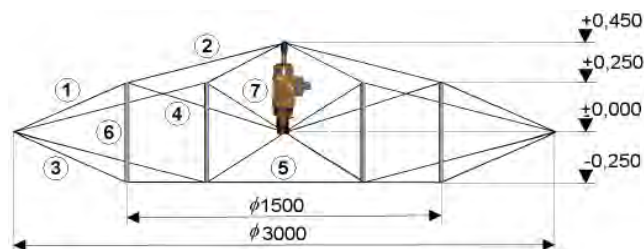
Section view of cable dome in Levy form with geometry and described basic structural members: (1) and (2) ridge cables, (3) and (4) diagonal cables, (5) hoop cables, (6) vertical struts and (7) actuator
